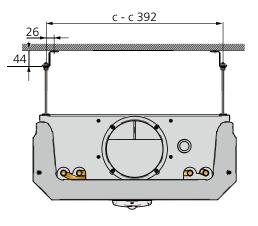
Installation - suspended installation with assembly fitting SYST MS-M8.
